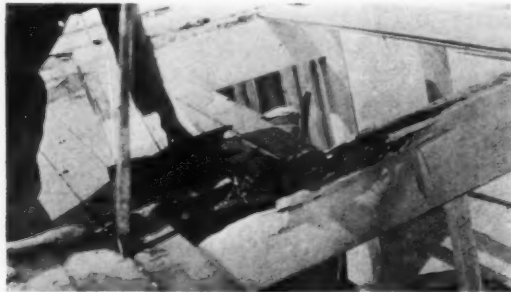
Ends of roof planks rotted over the supporting beam. The rot has also extended three or four inches into the beam.
